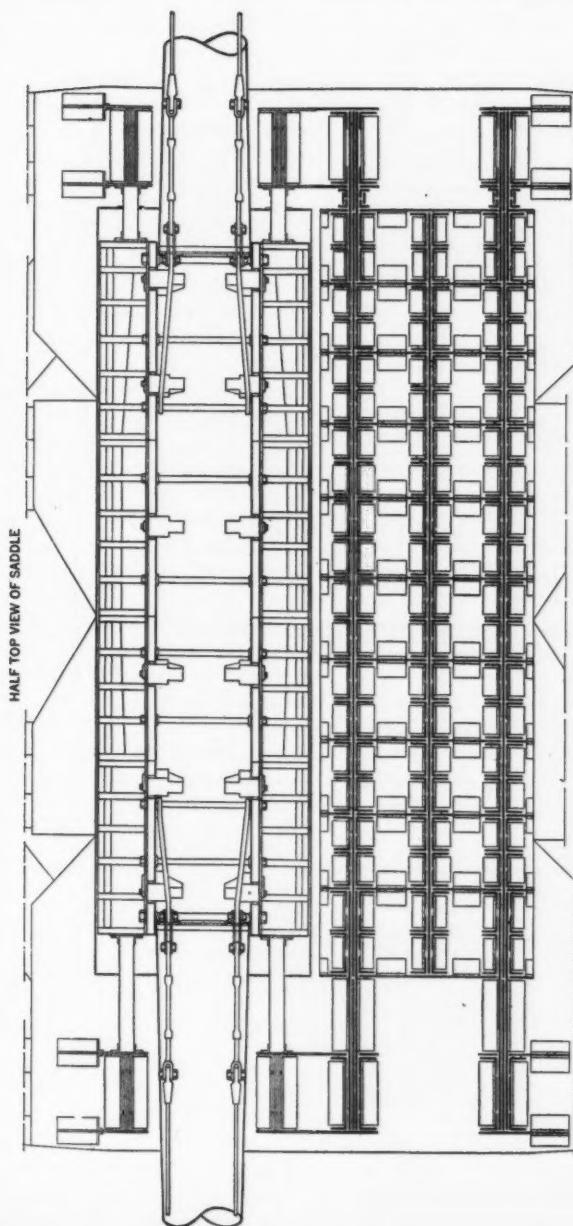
HORIZONTAL SECTION AND TOP VIEW, TOP OF TOWER (SEE, ALSO, FIGS. 14 AND 16).
